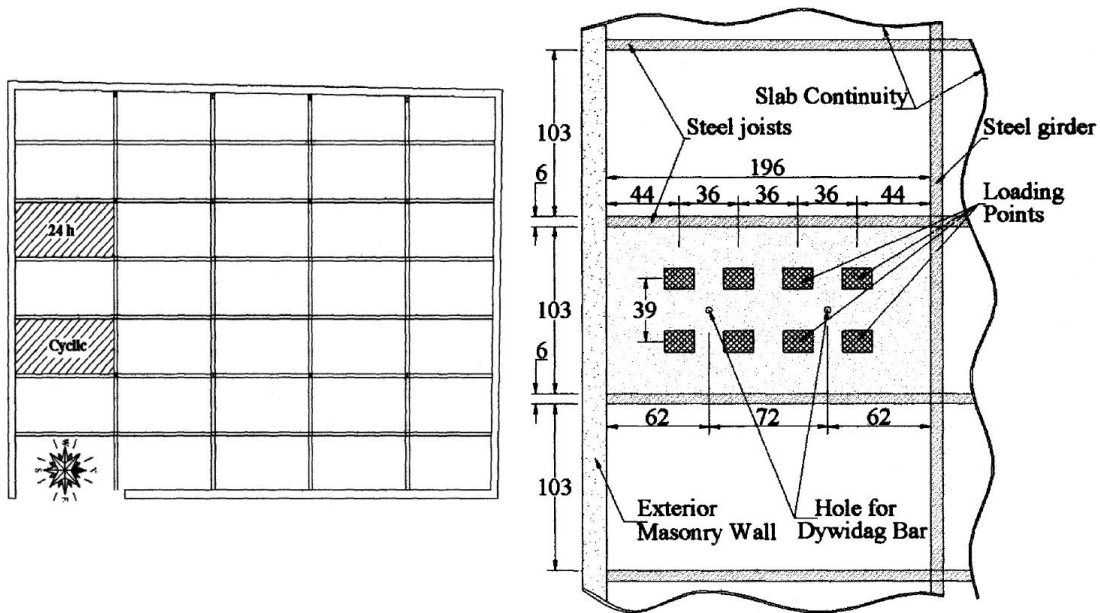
Case Study II: Floor Plan of Loading Test Area (U.S. units; 1 in. = 2.54 cm) (Casadei et al., 2005)
